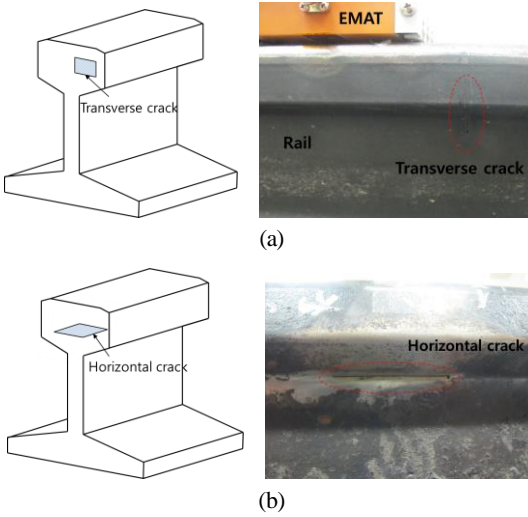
Artificial rail cracks (a) The transverse crack and (b) The horizontal crack
